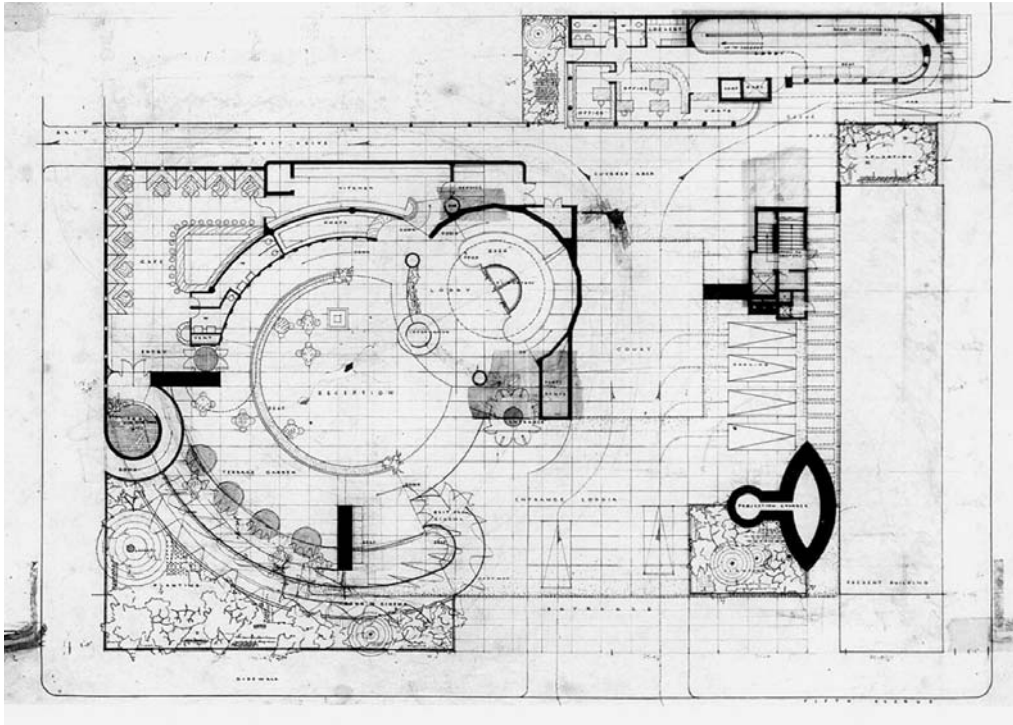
Guggenheim Museum, Original Sketch Plan, 1944
